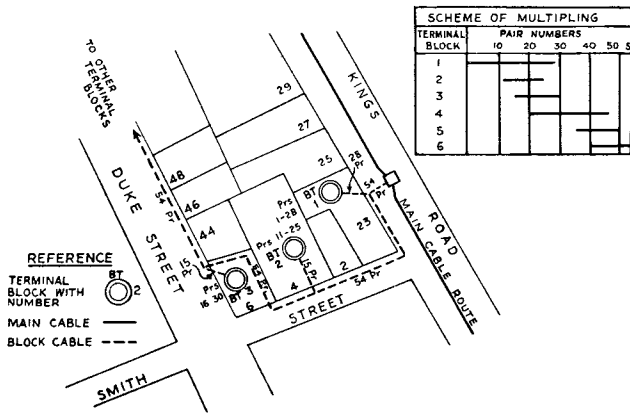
DISTRIBUTION PLANT—BLOCK CABLING.
